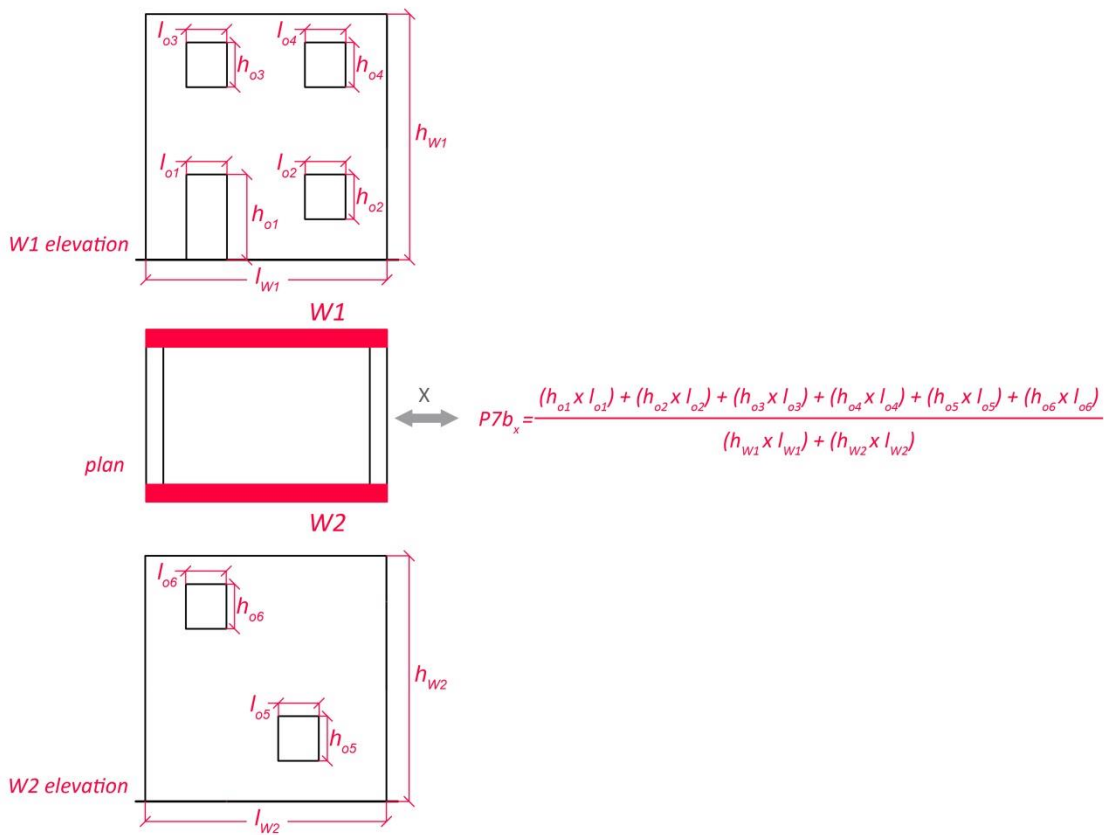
5: When evaluating buildings with more than one floor, the ratio P7b of wall openings can be obtained by taking into account the whole height of the wall (plan and elevation view)
